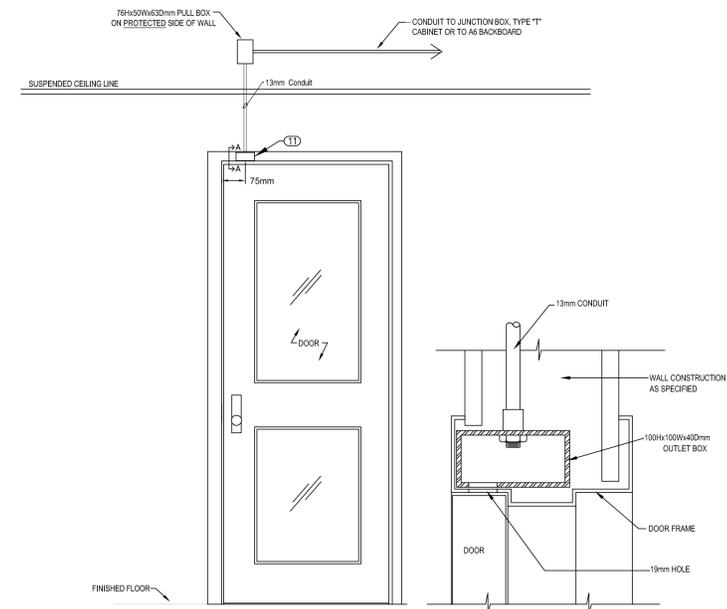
DETAIL DRAWING ACCESS CONTROL - ELEVATION OF SINGLE DOOR WITH DOOR CONTACT, FRAME MOUNTED READER AND ELECTRIC STRIKE
